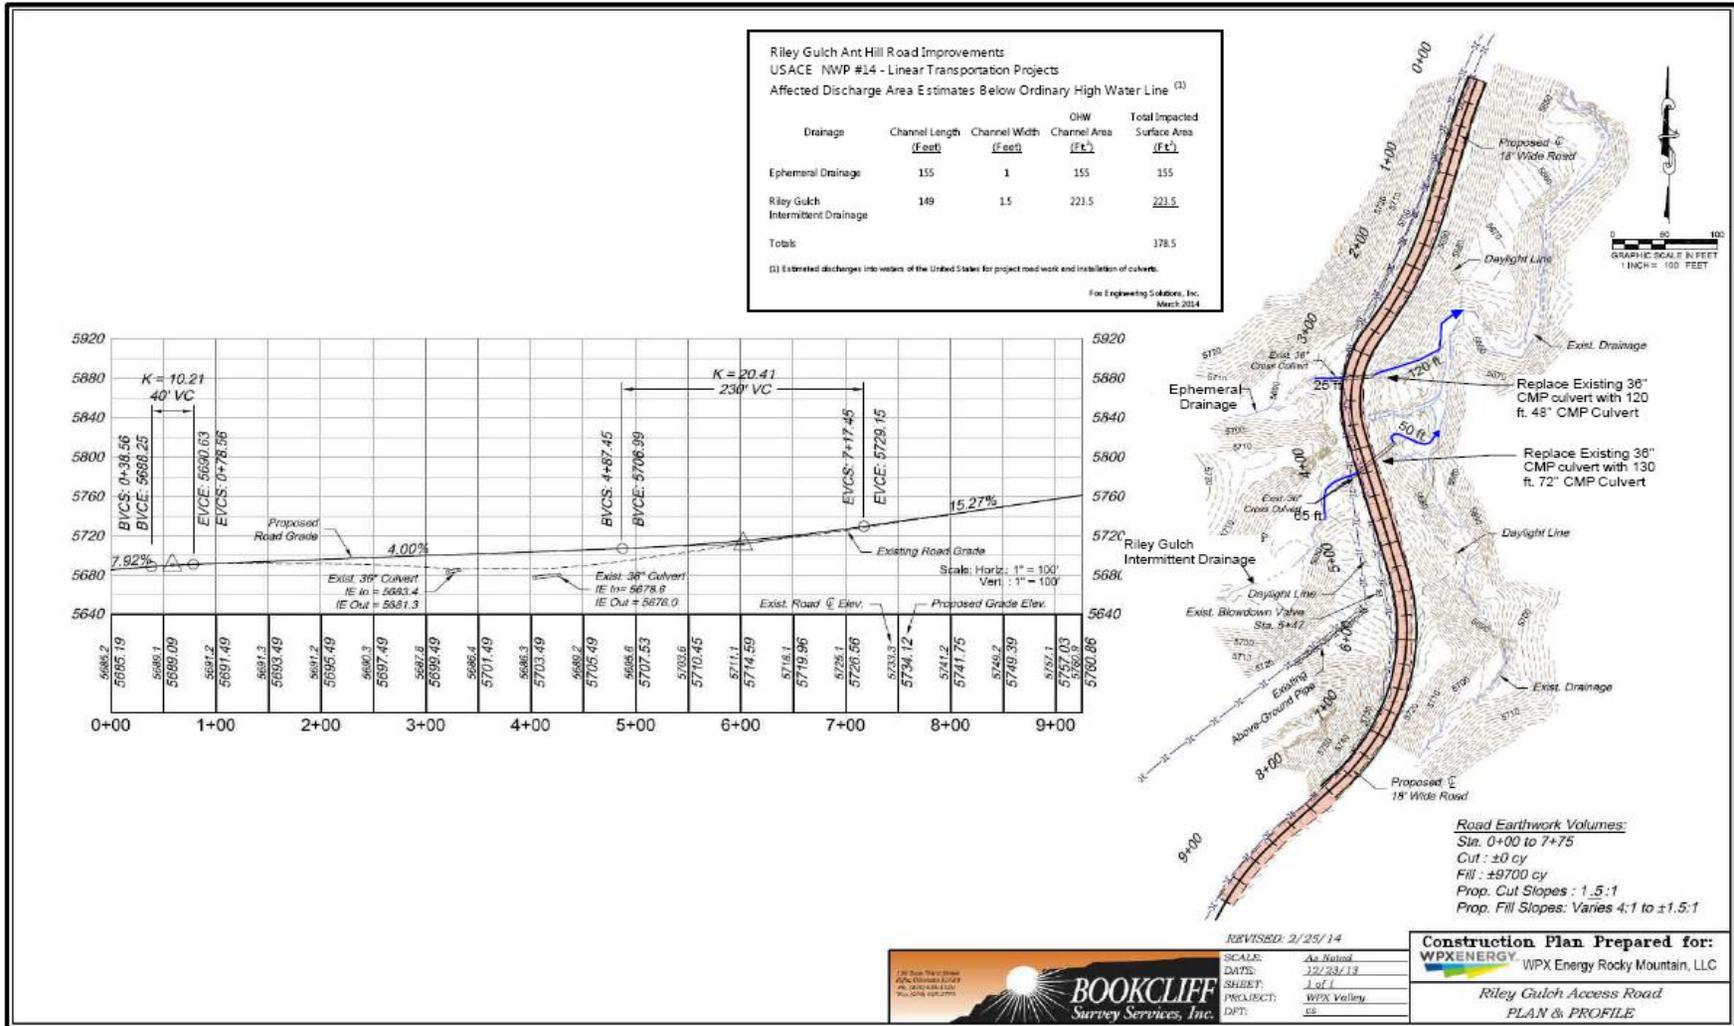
Road Construction Plat Showing the Proposed Road Culverts and Road Grade Improvements.
